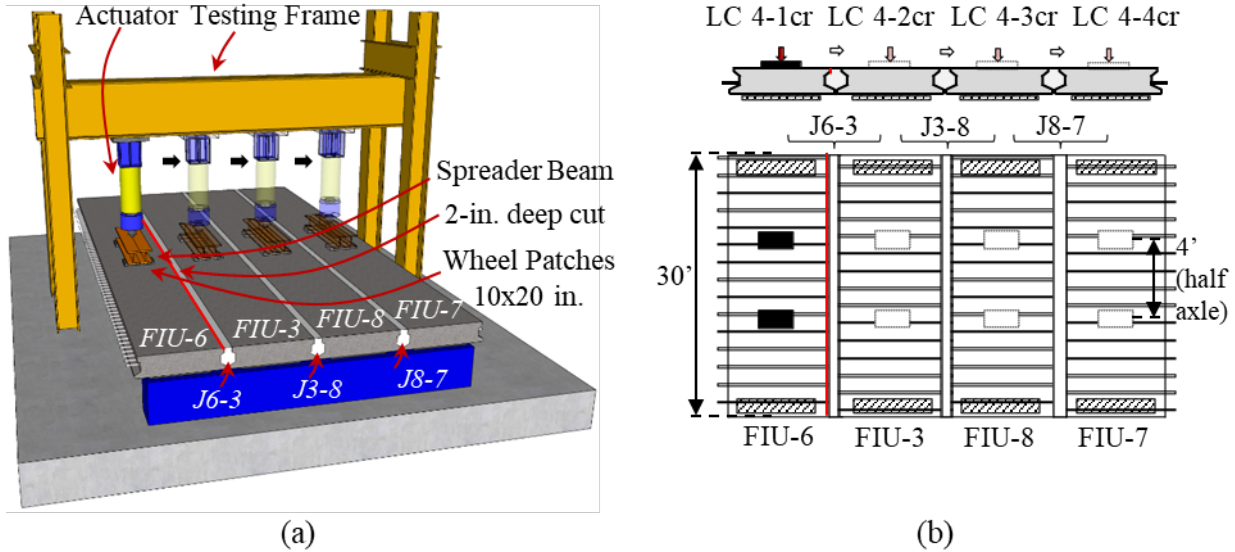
Test setup for Load Configuration 4-1cr through 4-4cr (a) schematic and (b) plan and elevation view
